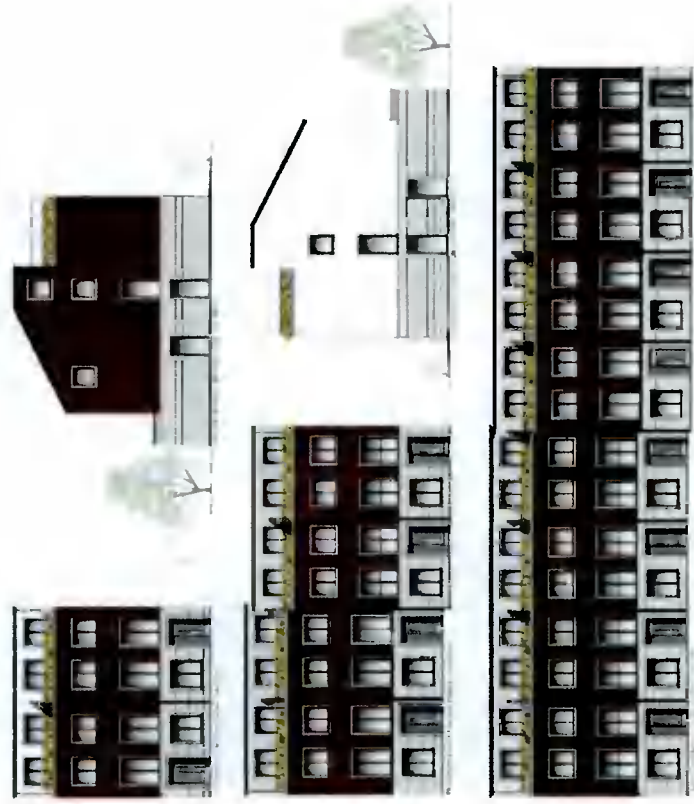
Proposed Typical Elevations - Produced by bba architecture
